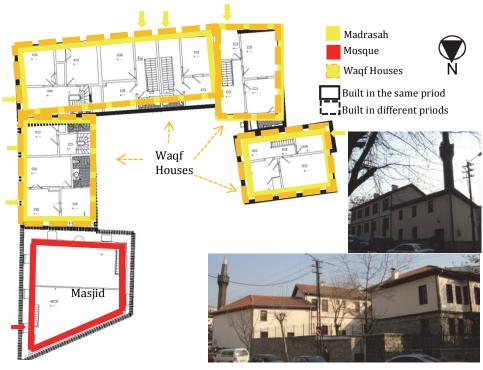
Restoration project of the complex in 2006, madrasah is not existent; instead waqf house additions are shown, & exterior photos, 2008 (Source: Archives of DGF)
